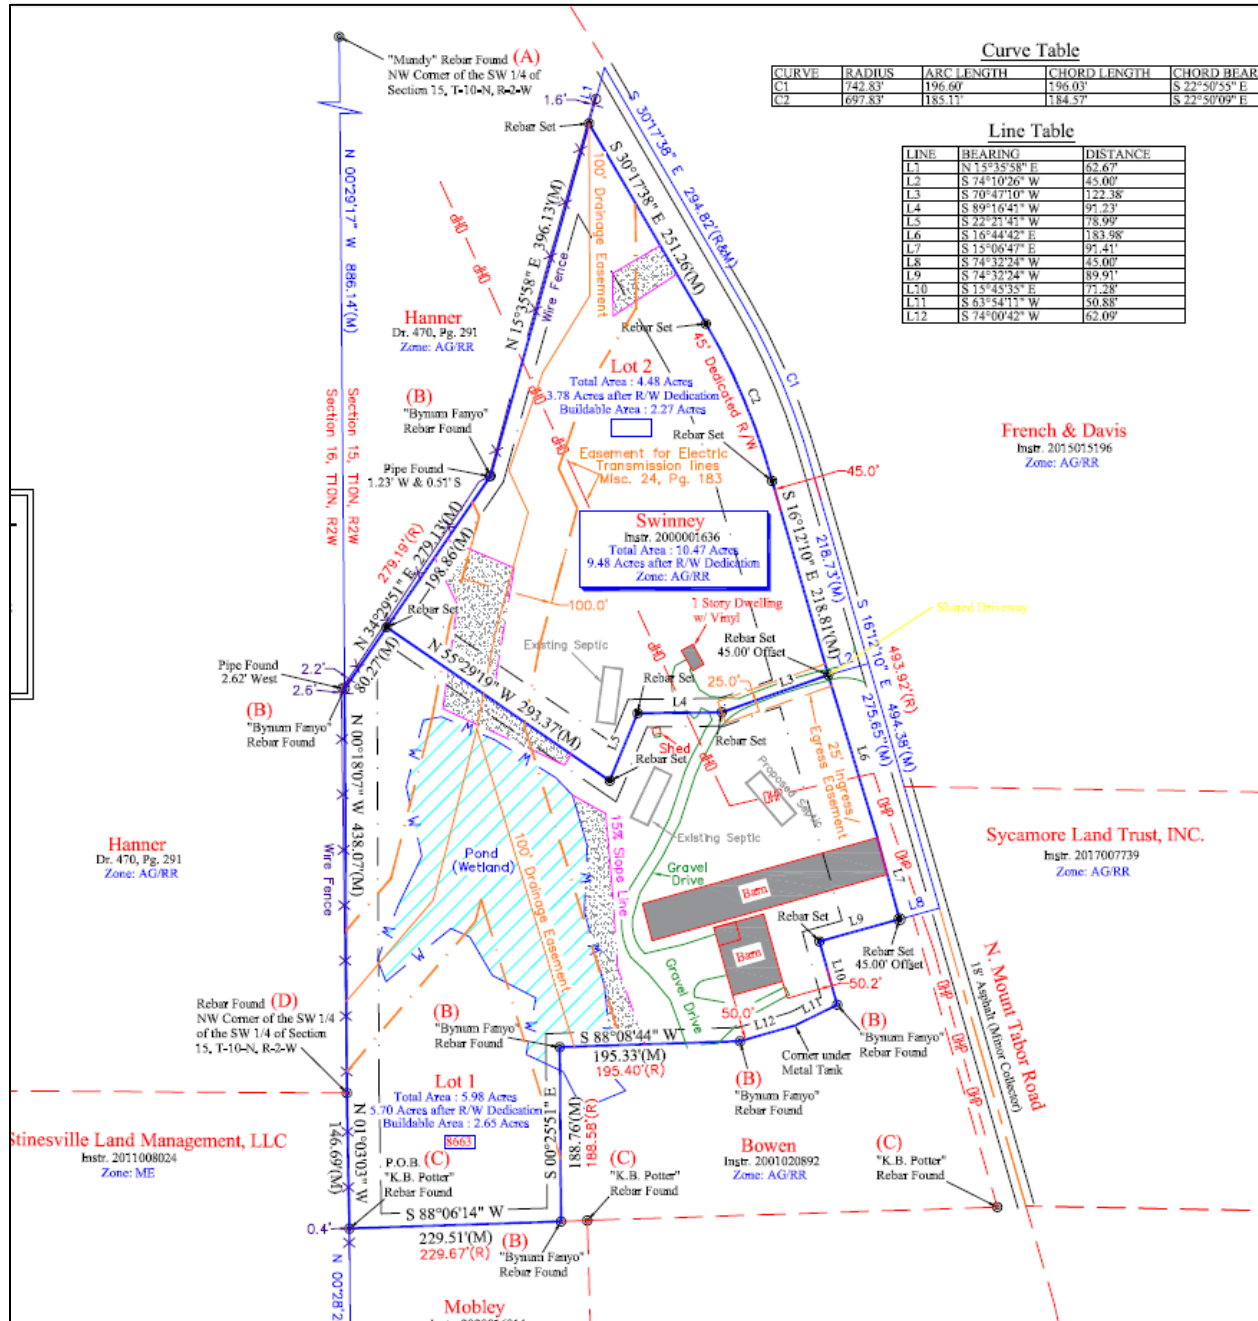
Swinney Sliding Scale Subdivision Preliminary Plat (w/ drainage easements)
